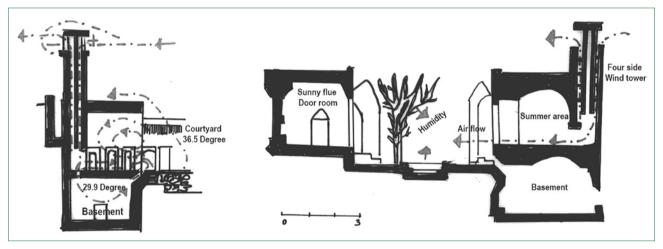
Vertical section through an Air traps and ventilation system and a typical courtyard in Yazd houses (Keshtkaran, 2011).
